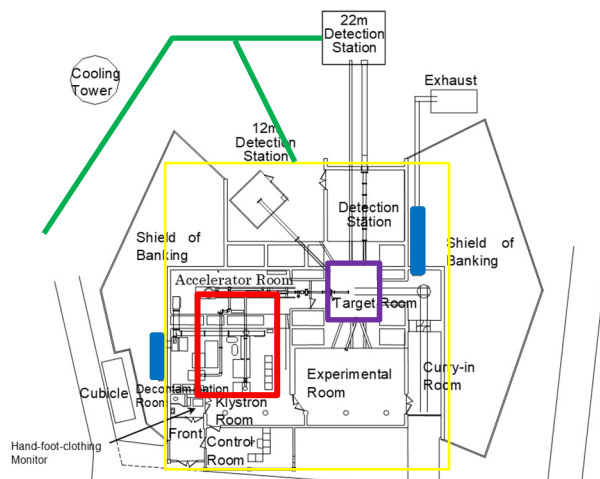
Floor plan of KURNS-LINAC (Blue line: renewal of supply and exhaust duct piping. Red rectangle: renewal of cooling water pipes. Yellow rectangle: waterproofing the rooftop and painting the exterior walls. Purple rectangle: repairing of target room. Green line: repair of passageway).
